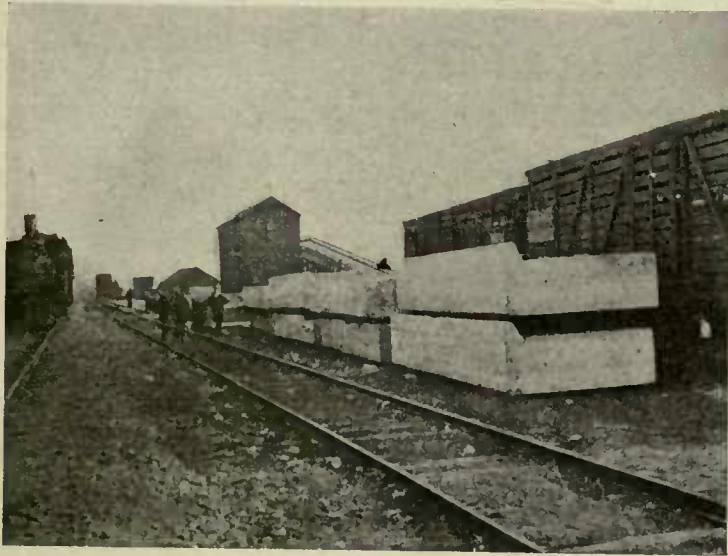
CONCRETE SLABS BEING SEASONED.
